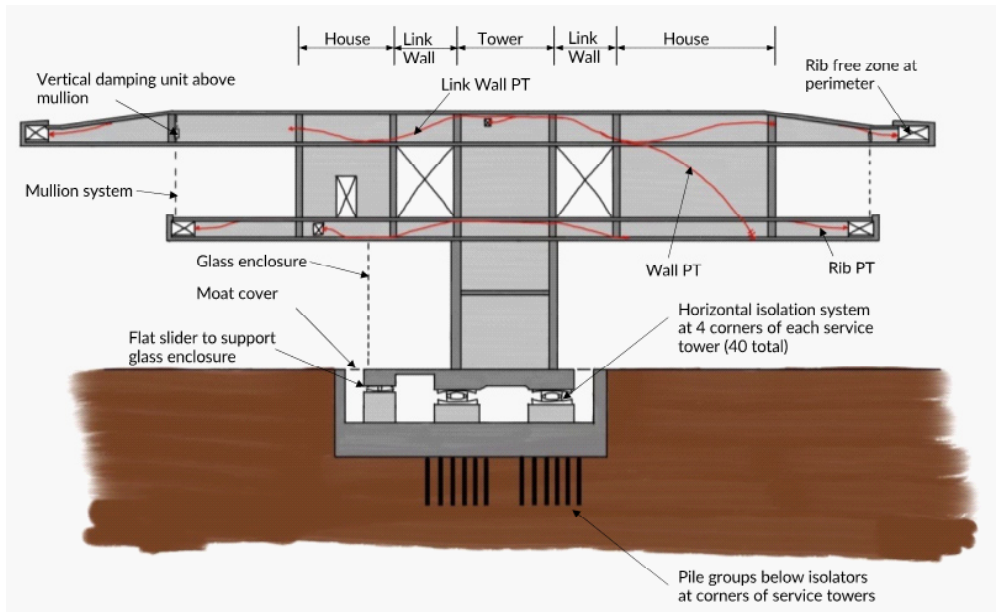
Conceptual building section showing cantilever structure hierarchy and seismic base isolation.
